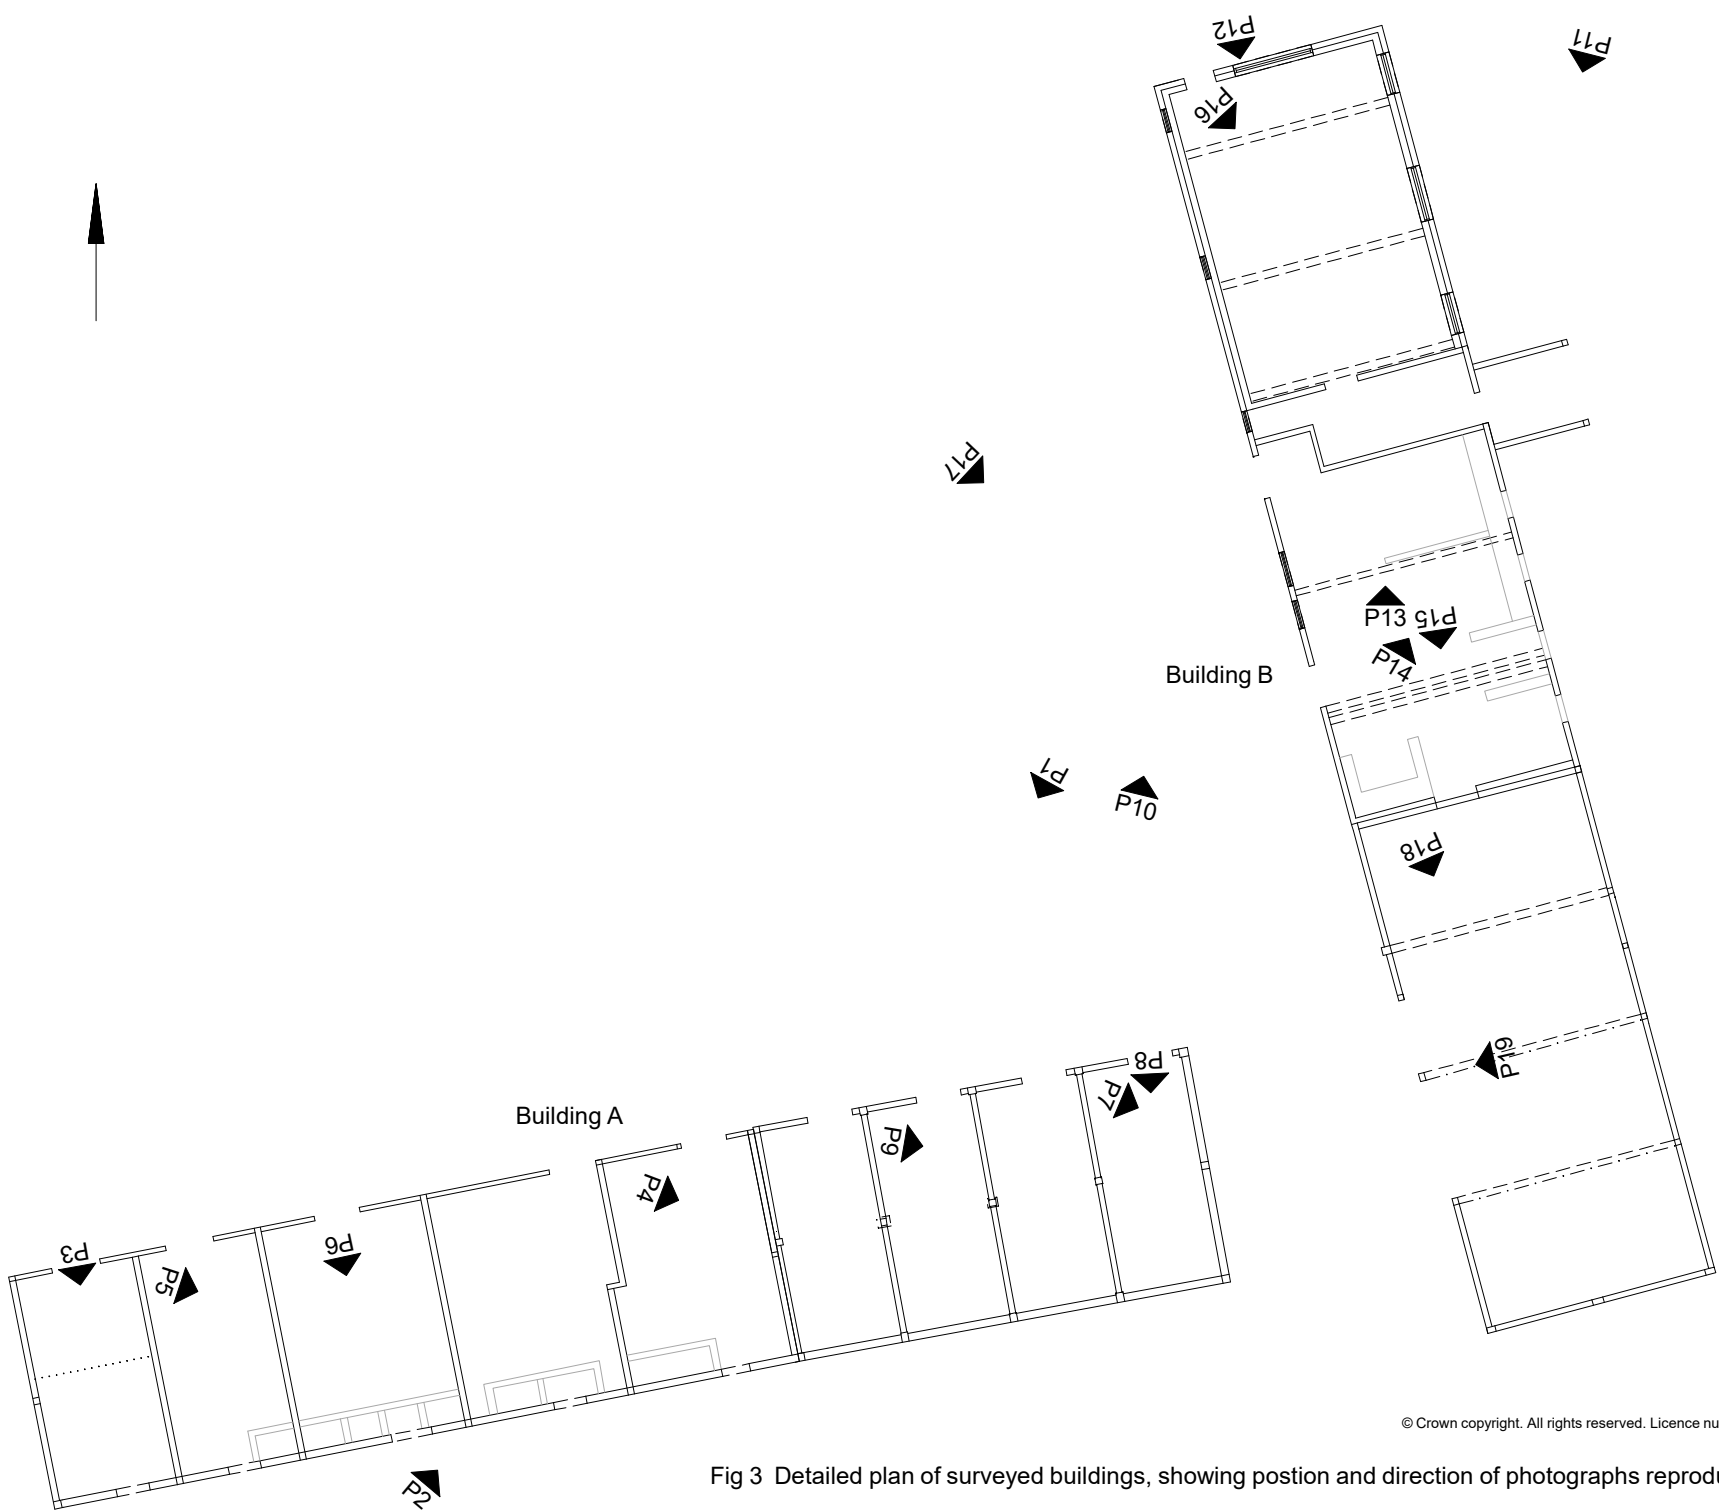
Detailed plan of surveyed buildings, showing position and direction of photographs reproduced in text.
